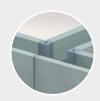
/42™ C (same as 6500/45™ 6600/48™, 6600/56™ en 6625/60™) Structural connection at top, bottom and side connections
